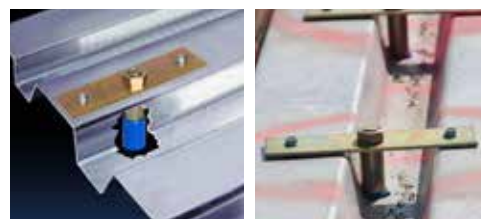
Fig RDI - Roof Deck Insert For No-Concrete Steel Decks
